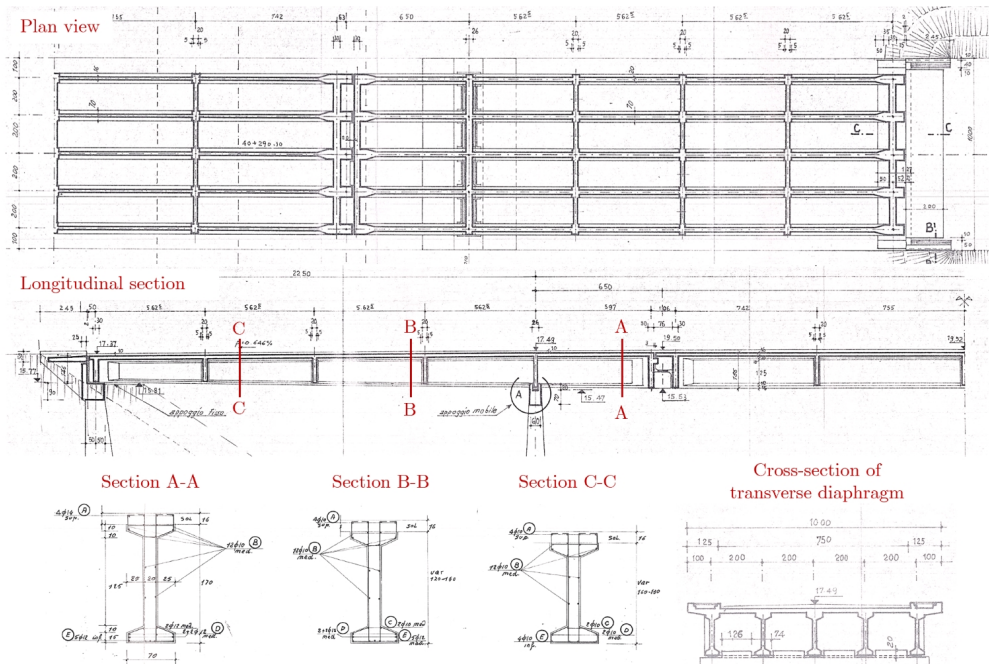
Original drawings of one of the investigated overpass (deck made up of 5 girders): (a) plan view of the overpass, (b) longitudinal section of 1/2 girder, (c) transverse sections of one girder at different abscissa and (d) transverse section of the bridge deck.
